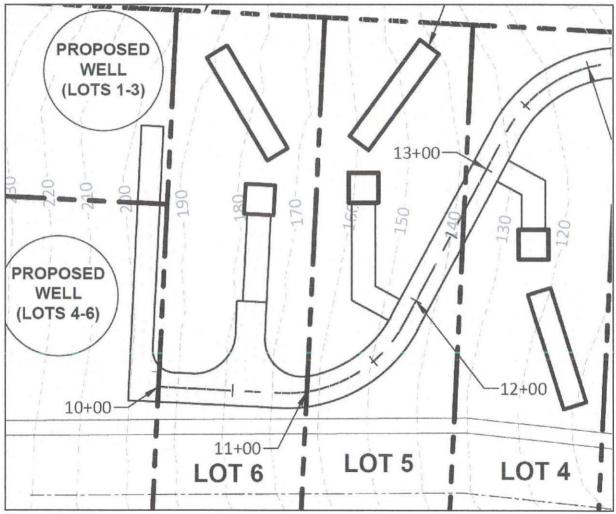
Detail view of existing topographic contours shown in HHPR concept site plan. Lots are 100 feet wide for scale.
